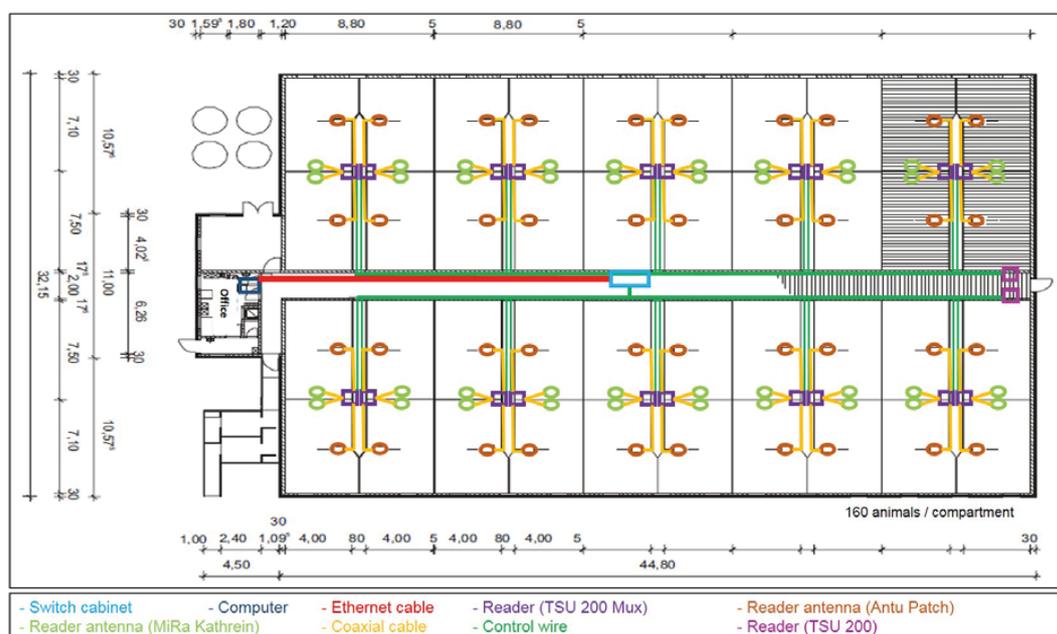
Plan elevation of example barn B for 1600 fattening pigs with illustration of fitted RFID system hardware components (© KTBL 2015b, altered)
